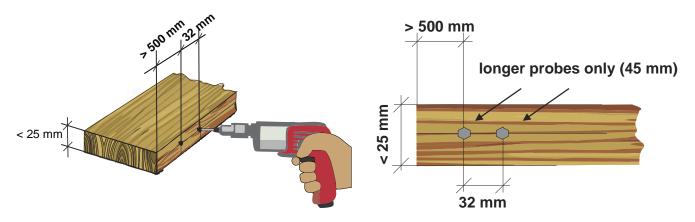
Probes placement in boards thinner than 25 mm (side view)
